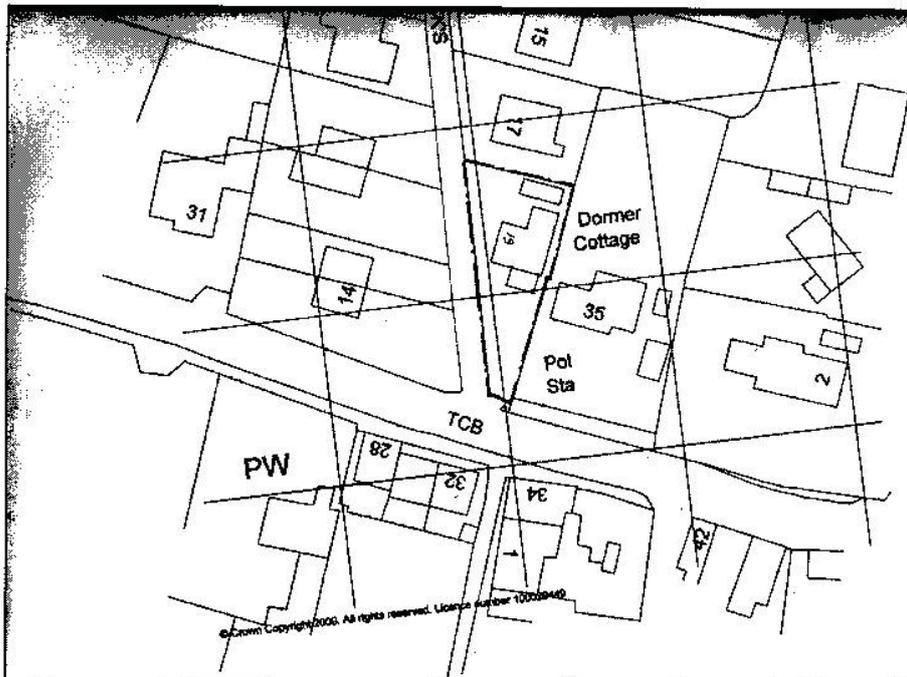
Site location (extracted from drawing supplied by GWP Architects) not to scale
